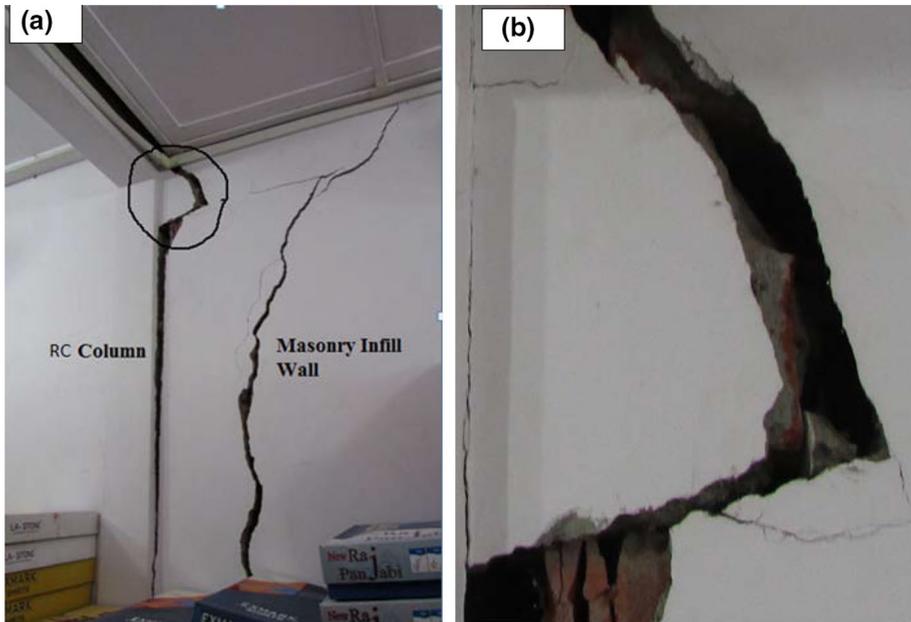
a Formation of vertical cracks in the masonry infill reinforced concrete wall and b cracks in RC column–masonry wall joints
